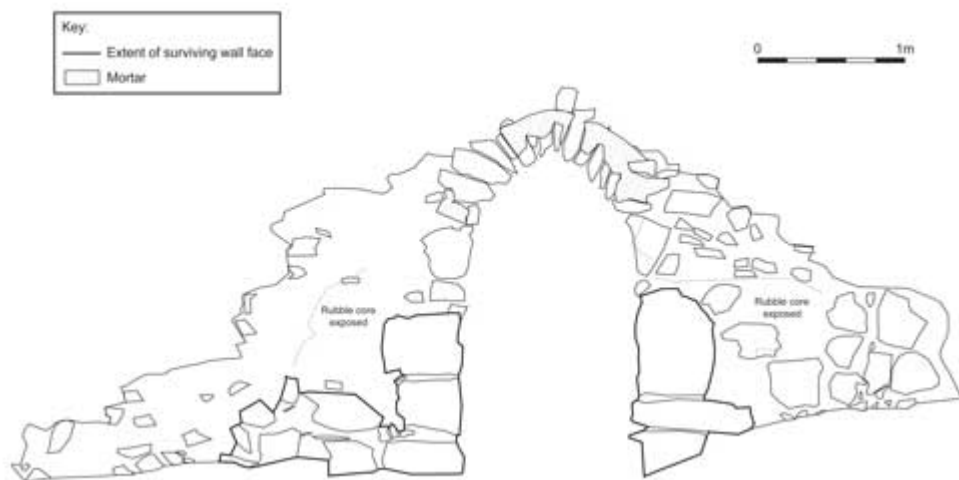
; Structure 5, Rusticated Arch: Elevation b
